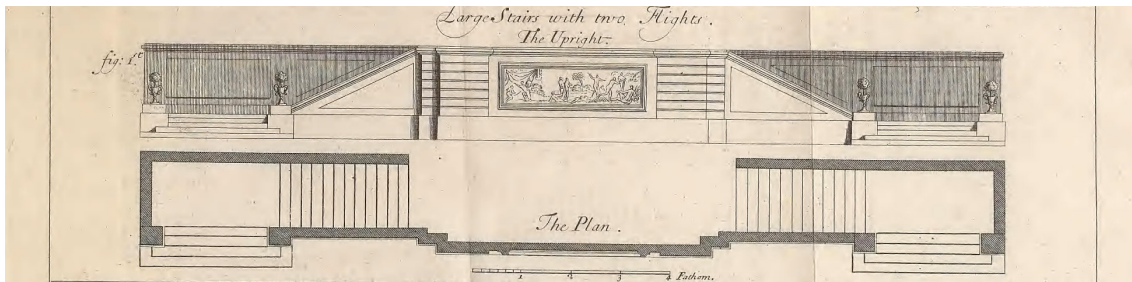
Antoine Joseph Dézallier d'Argenville, *Large Stairs with Two Flights* (Dézallier d'Argenville 1712:126b, Plate 2H, figure 1). Relief of mythic *invenzione* in centre of retaining wall.
